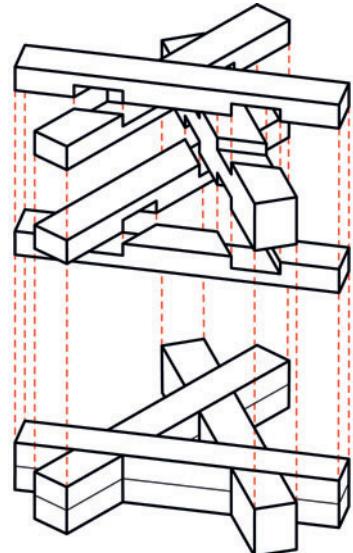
Multiple lap-jointed components assembled to form a continuous single-layer gridshell surface
